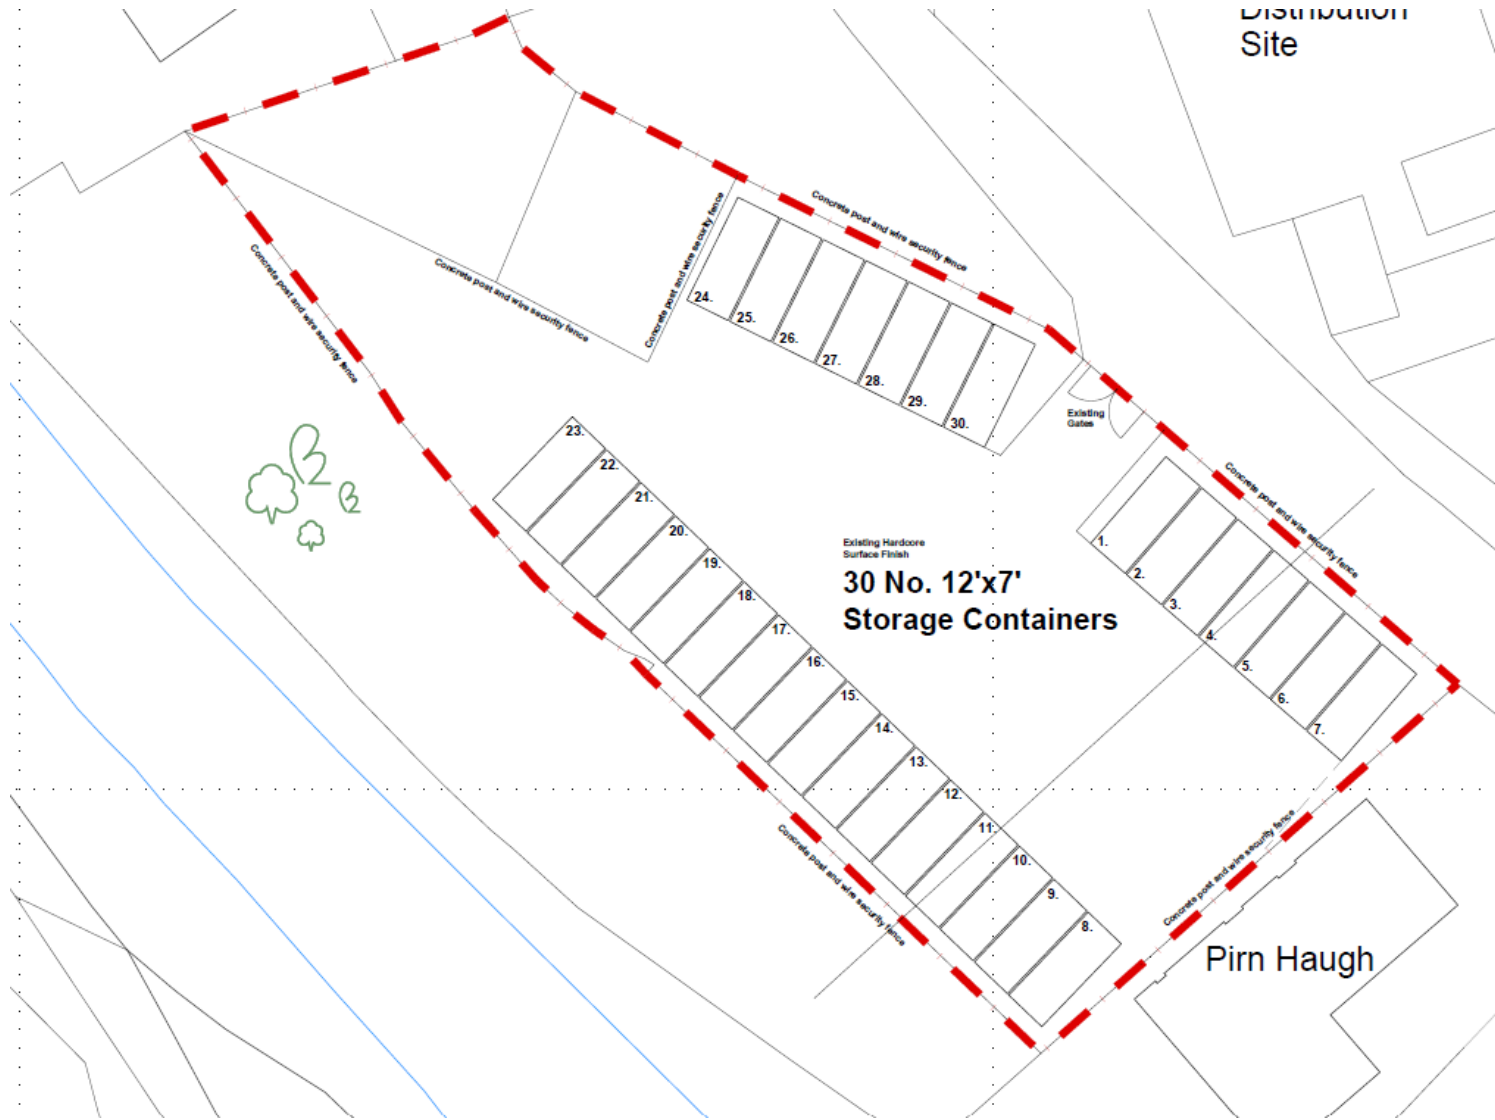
Extract from MDC-0148-L(-1)151 Site Block Plan.
